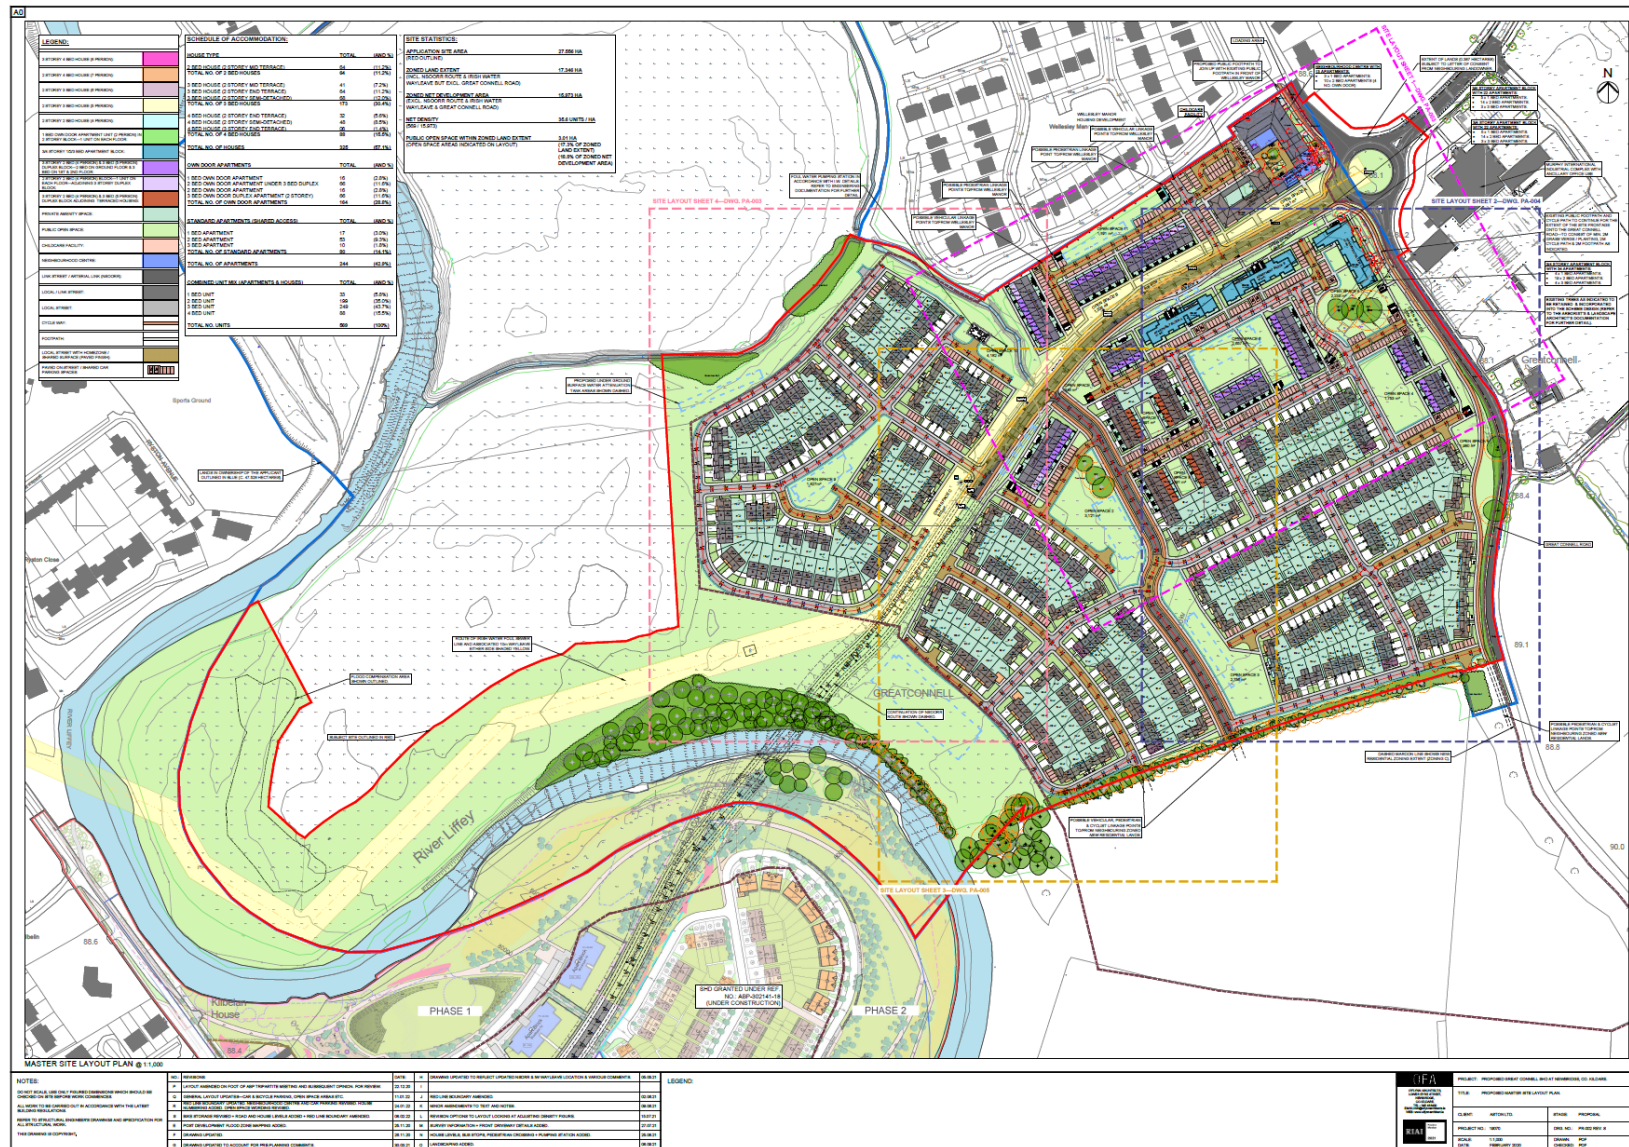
Proposed Master Site Layout Plan. Source: O'Flynn Architects.
